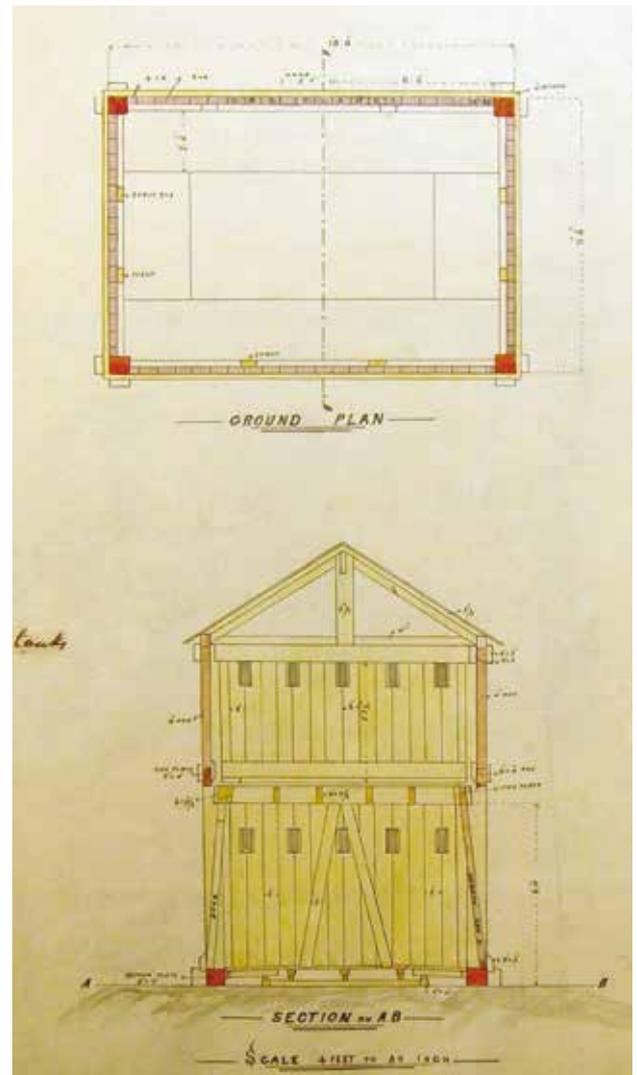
Akasha. Plan and elevation of one of the wooden block houses (WO 78/173, Courtesy National Archive).
